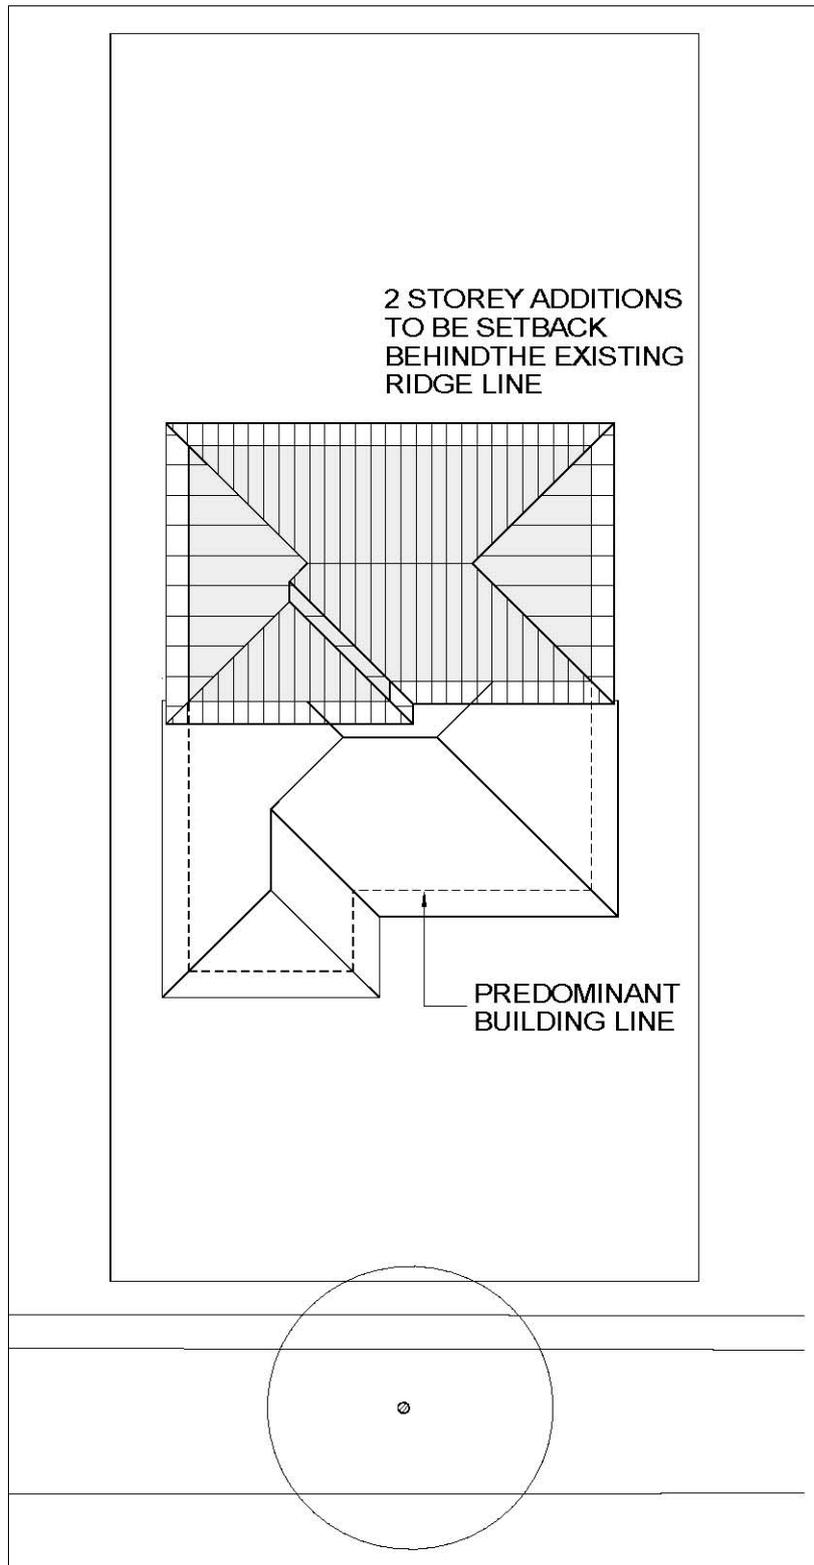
Plan Showing Second Storey Addition to Traditional Dwelling
